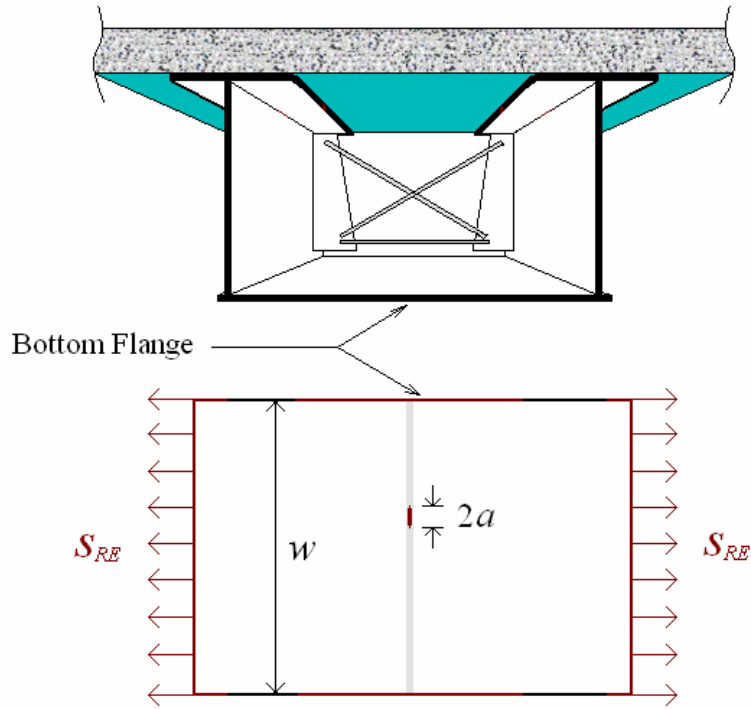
Detail in a Fracture-Critical Member of the Box Girder Bridge.
